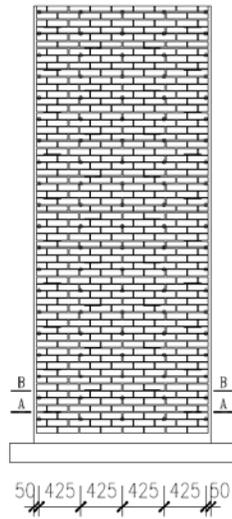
Layout of brick ties on masonry wall A Fig. 10: Sectional details of brick ties on masonry wall A
